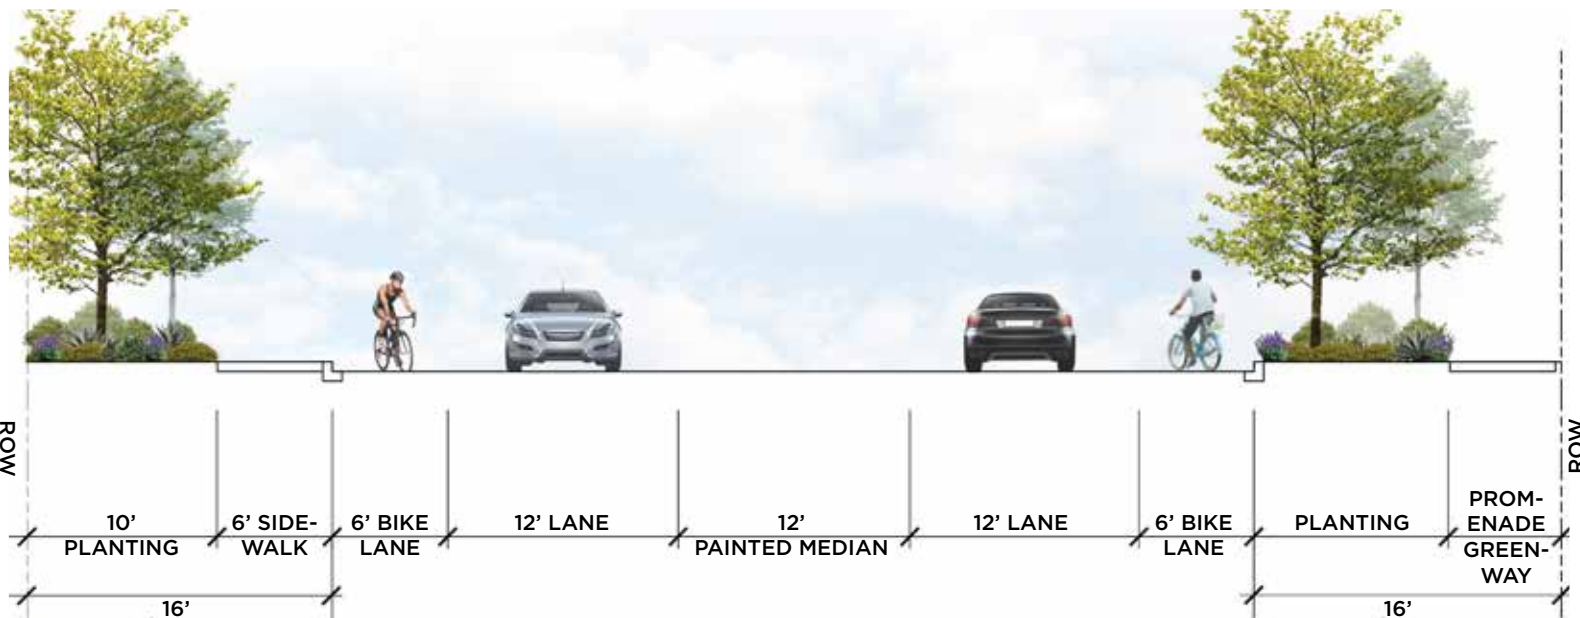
ENLARGEMENT MODIFIED COLLECTOR STREET SECTION H
